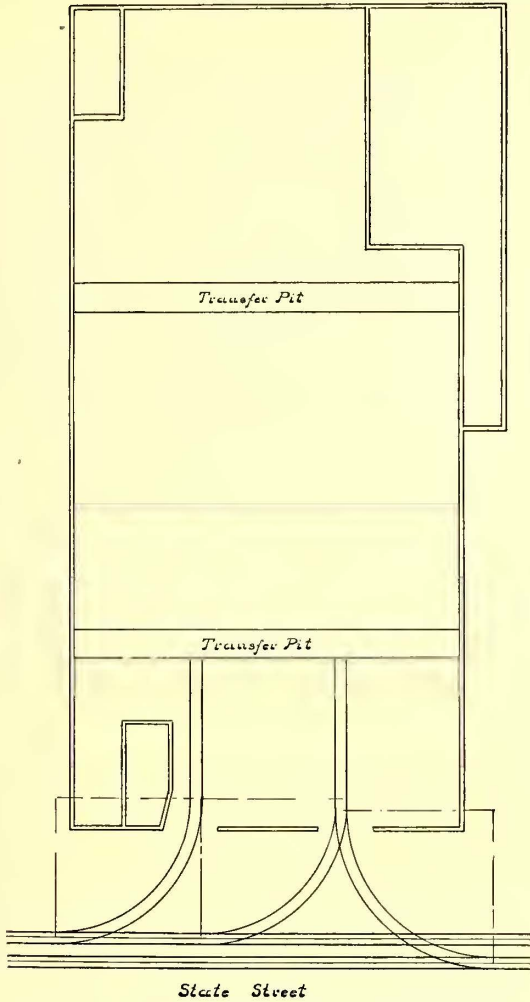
OLD PLAN OF 61ST STREET CAR HOUSE—CHICAGO CITY RAILWAY.
